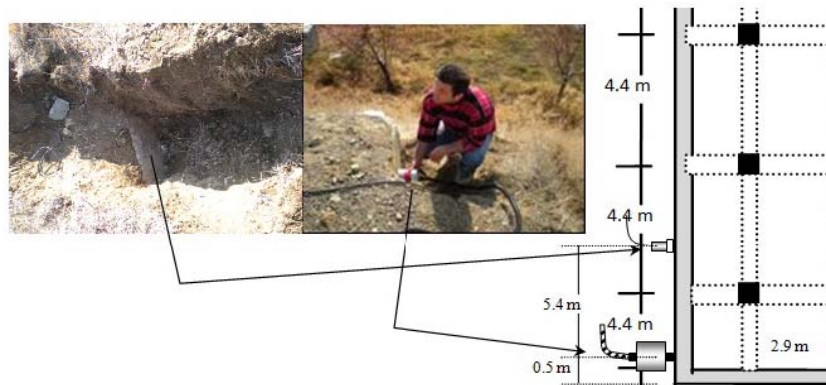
The general test setup and instrumentation on side exterior wall of TANK_B (TEST_2)
